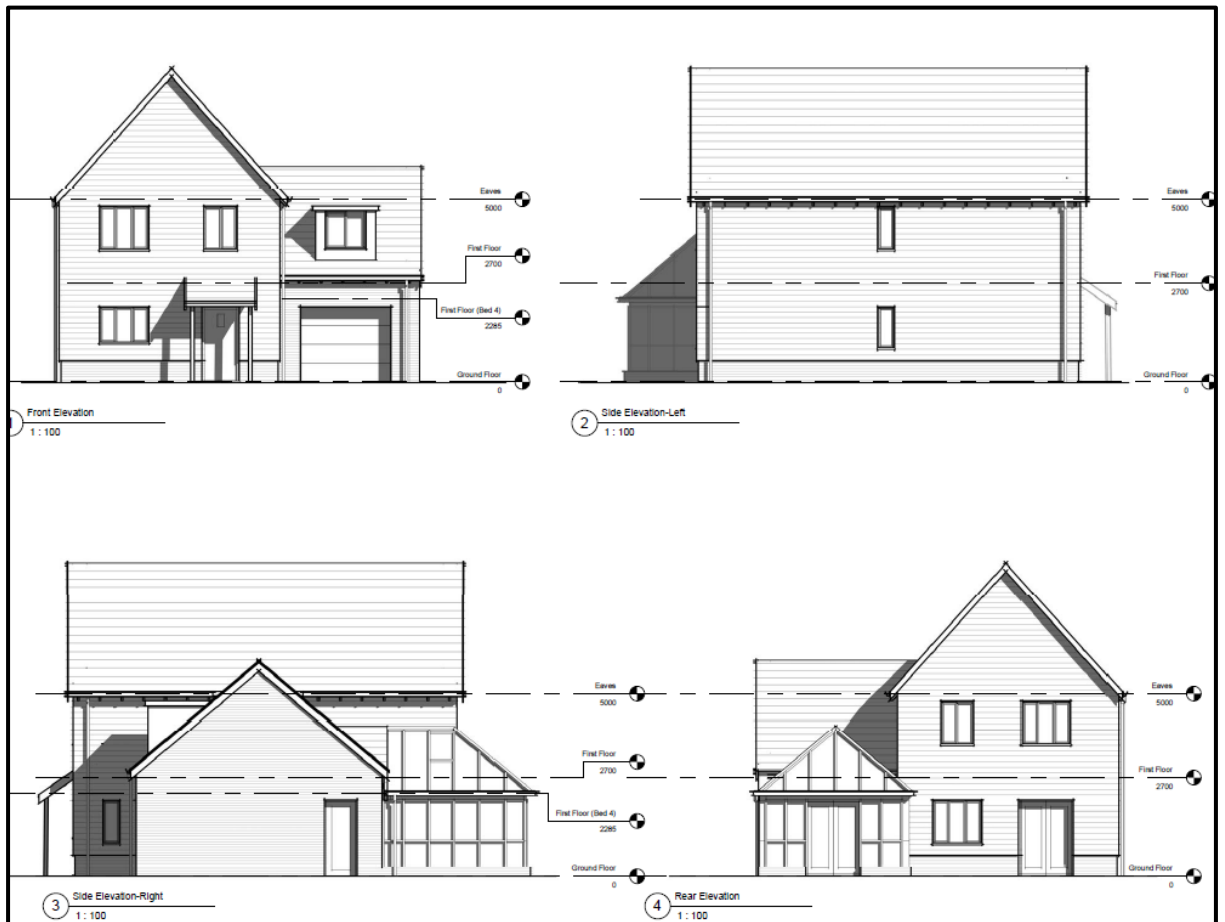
Typical house type Hever SX plot 8 proposed elevations
